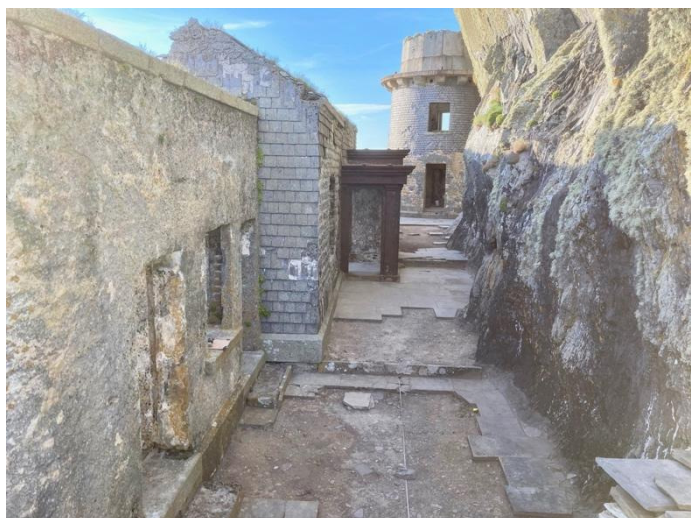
Front to back, yard enclosure wall, House (2) & lighthouse.
